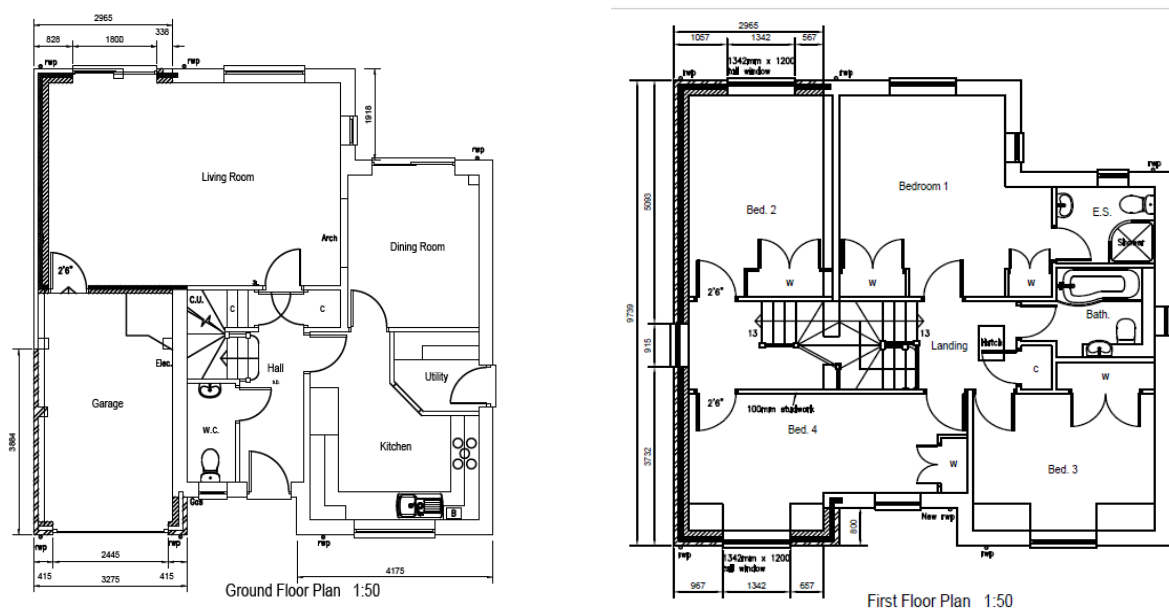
1: Floor plans of the case study building with a scale of 1:50
